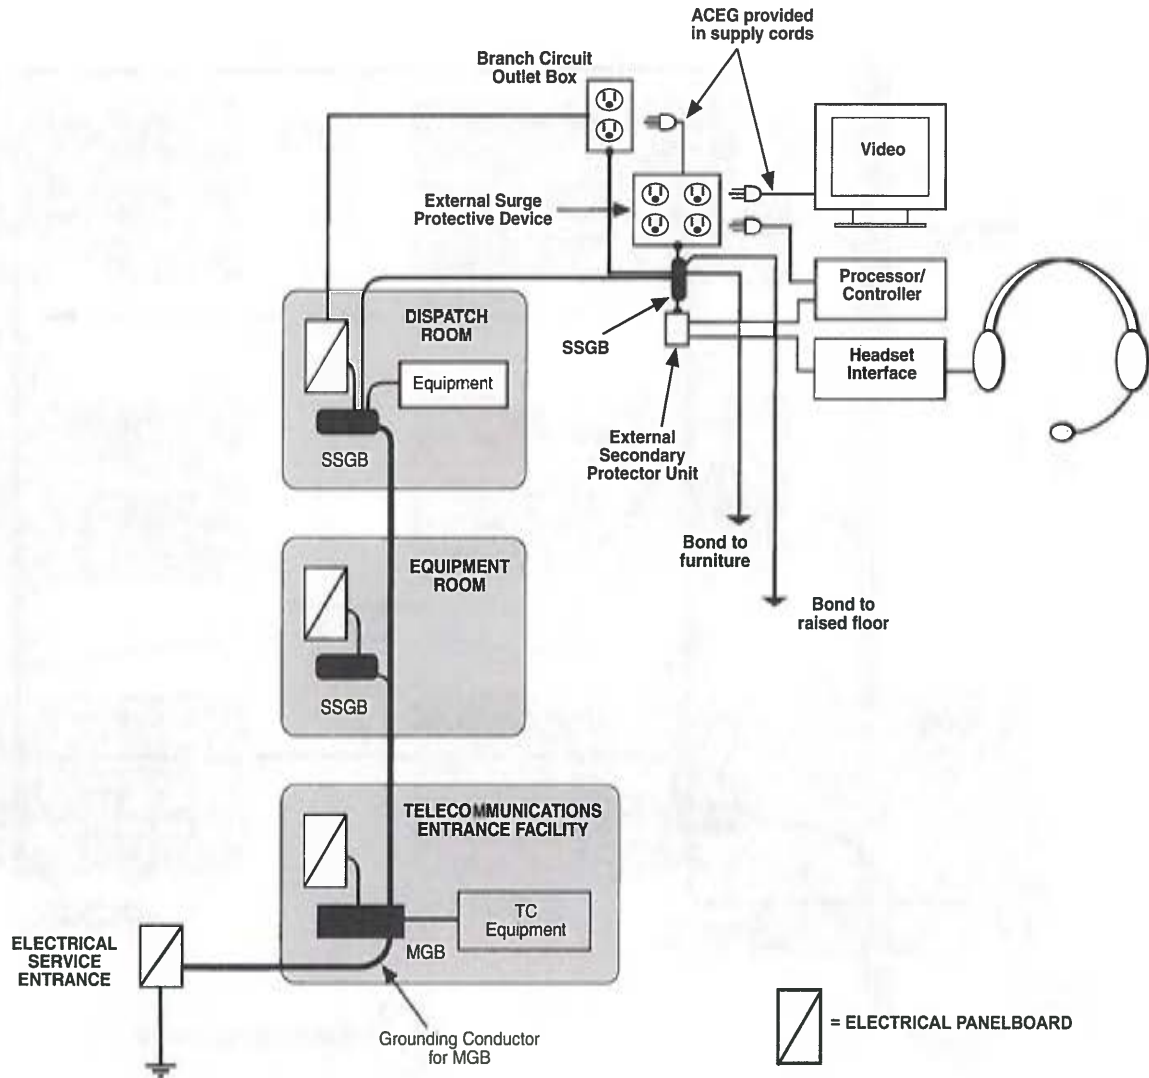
SINGLE-STORY BUILDING WITH COMMON ENTRY LOCATION
